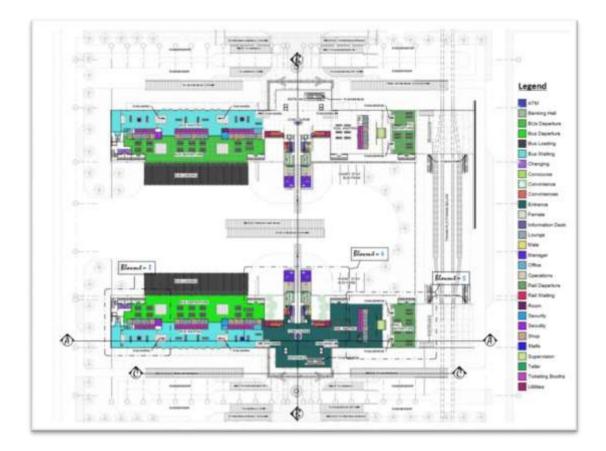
Proposed ground floor plan Source: Researcher's design proposal, (2020)
